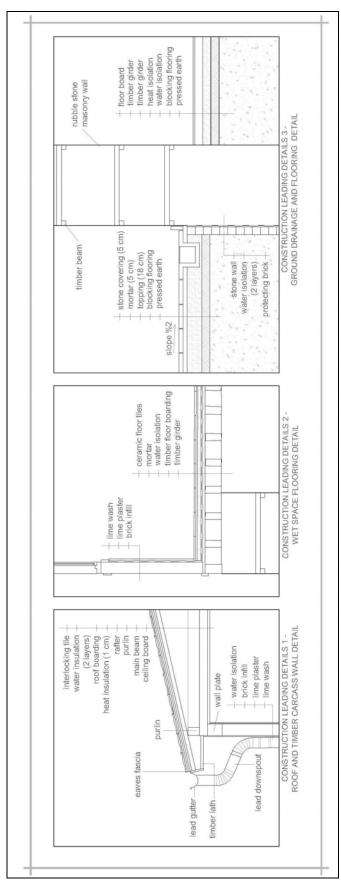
Conservation Proposal of Hasanağalar House – Principle Details
